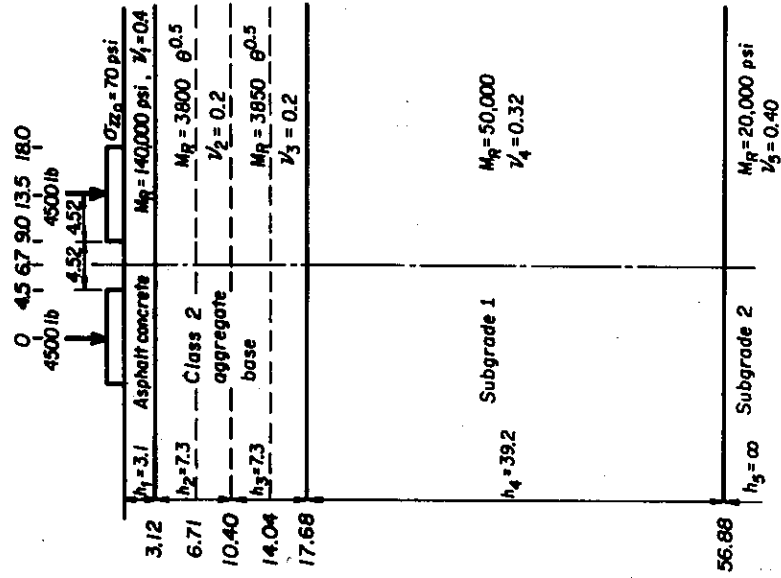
Pavement structure for sample problem Section 1, San Diego Test Road.
